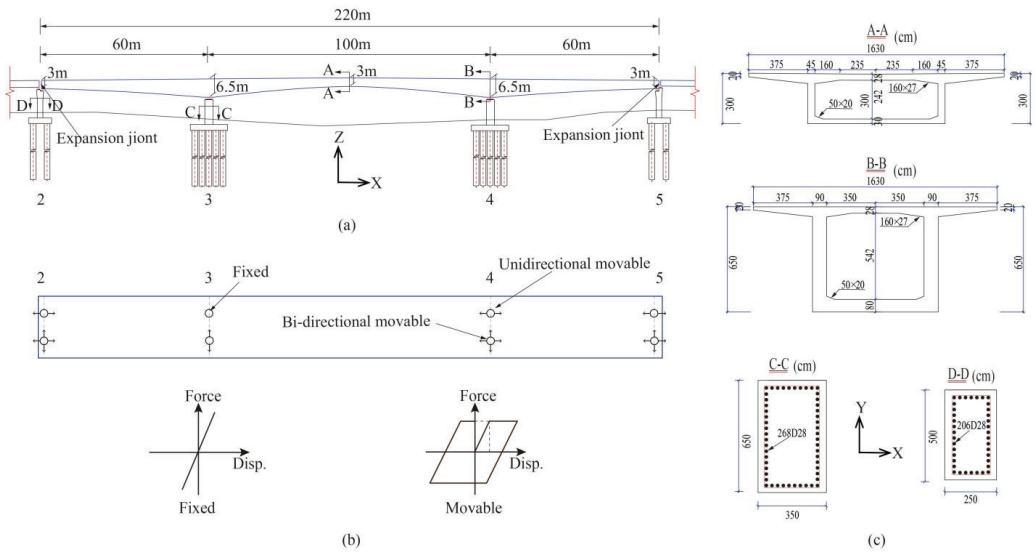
Description of the girder bridge: (a) elevation and (b) plan of the prototype bridge and (c) section properties.
